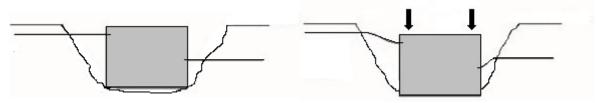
shows the result of an excessive excavation. In this situation, the long sloping ends of an excavation do not provide support for the inlet and outlet piping connected to the septic tank. The weight of the soil above the unsupported piping may cause the breakage of the piping.
